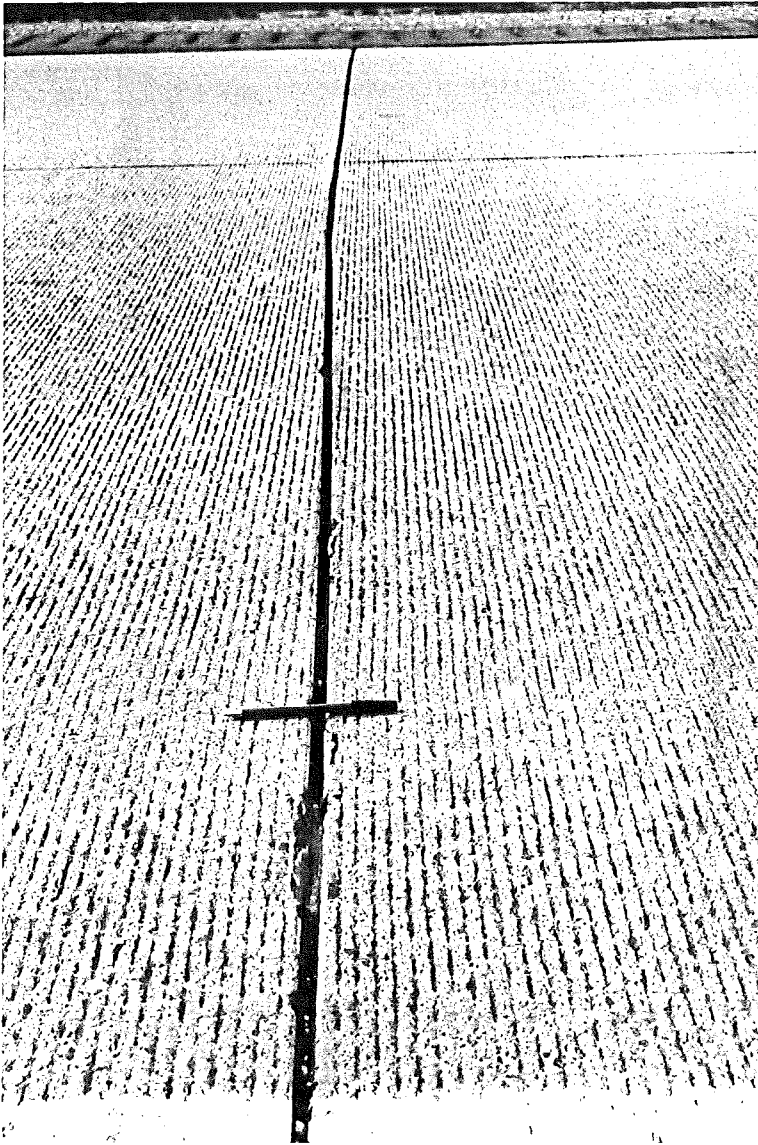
A typical contraction joint on CSN# 11017-32516A (Section D) WB, showing some spalling along the joint.
